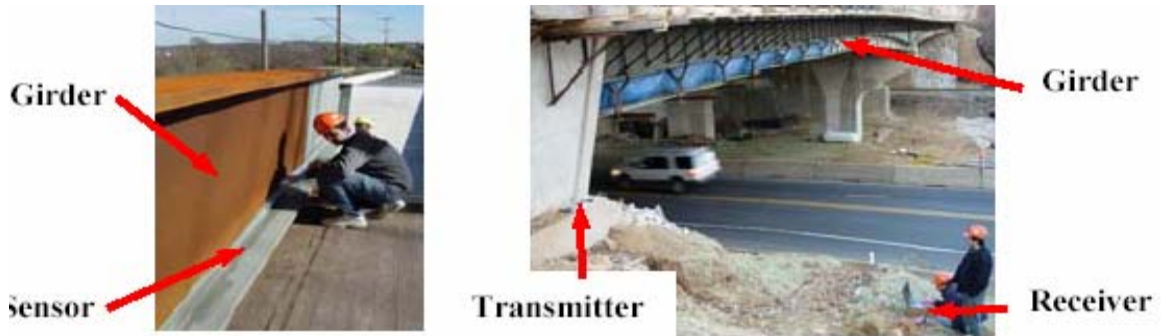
Sensors on Girder 1 of Bridge MD140
